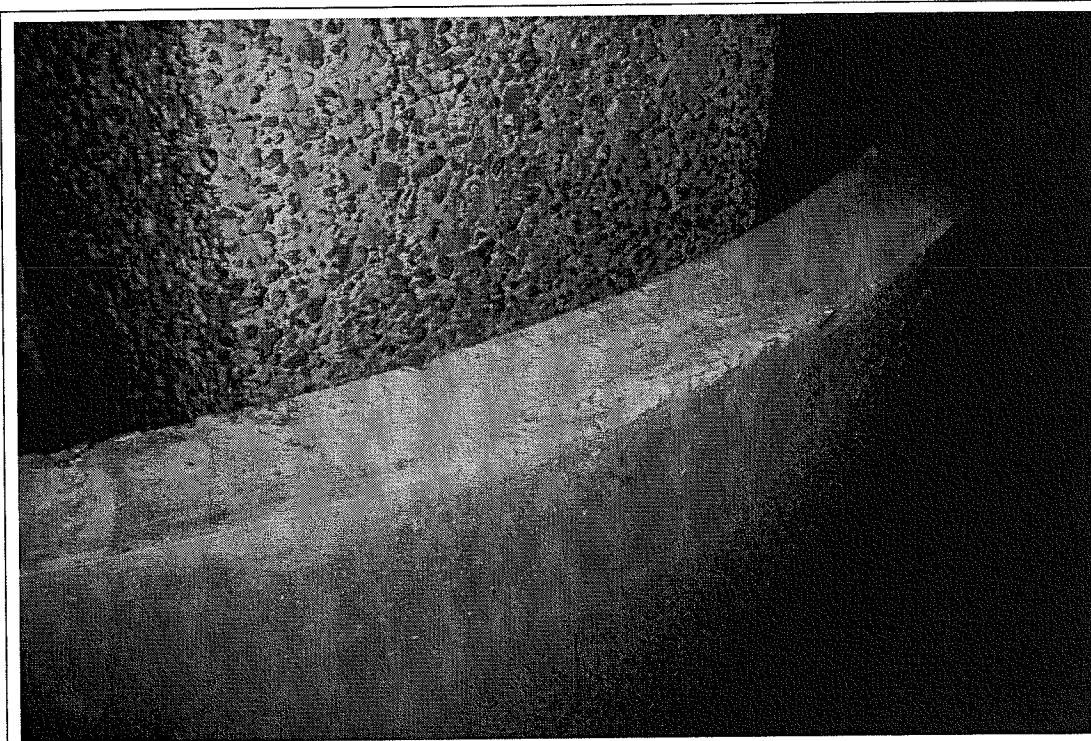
Main Passenger Lobby Upper Mezzanine Office Area – top of column casing situated above fireproofed sprayed deck (location of dust sample #1)
